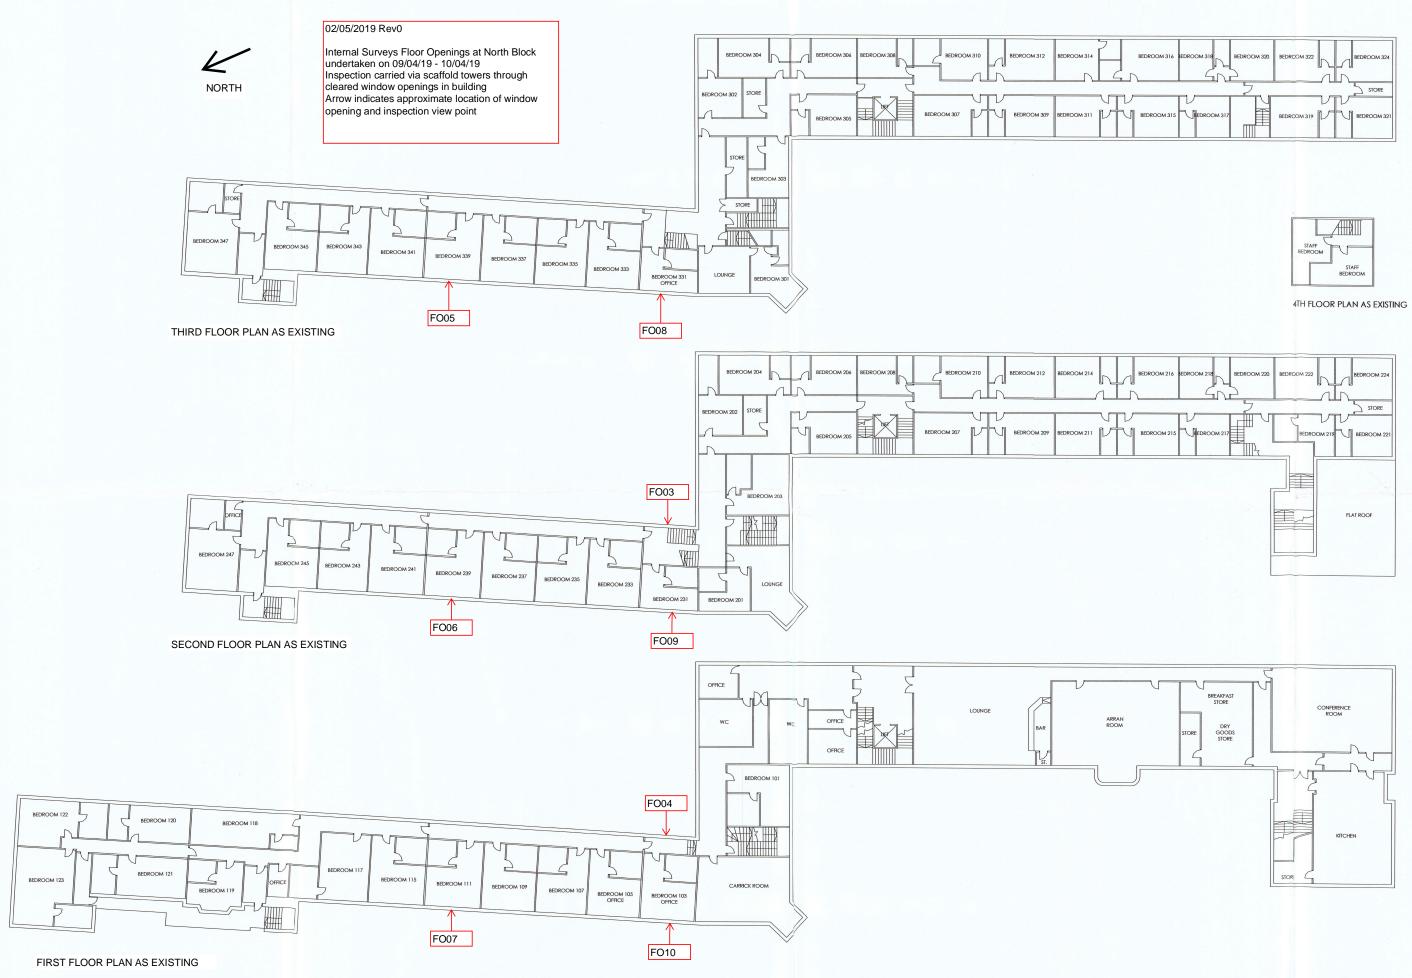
Plan of Station Hotel Building North Block 1st Floor, 2nd Floor and 3rd Floor/Mansard Roof showing Internal Survey (via cherry picker) Defect/Observation Locations
